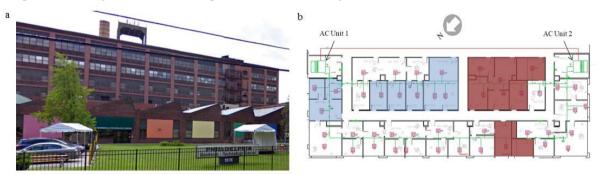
(a) elevation; (b) floor layout, adapted from [17].
